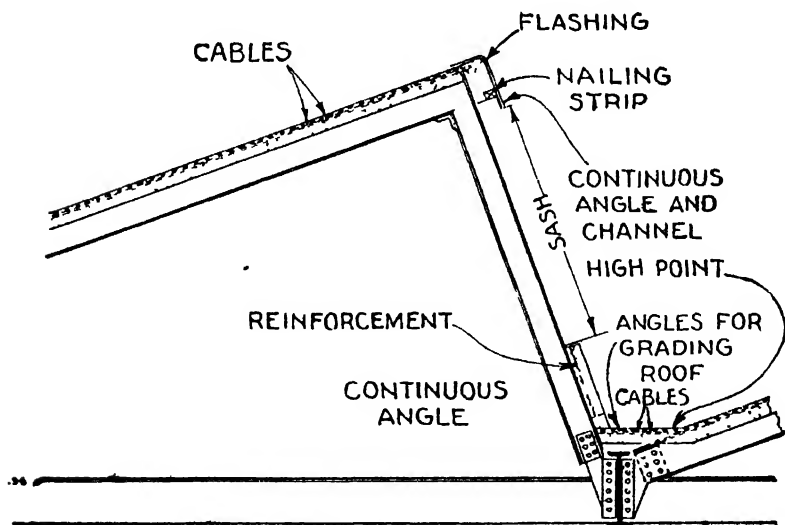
,744.—Standard sawtooth without purlins, fireproof roof construction, upper end.
